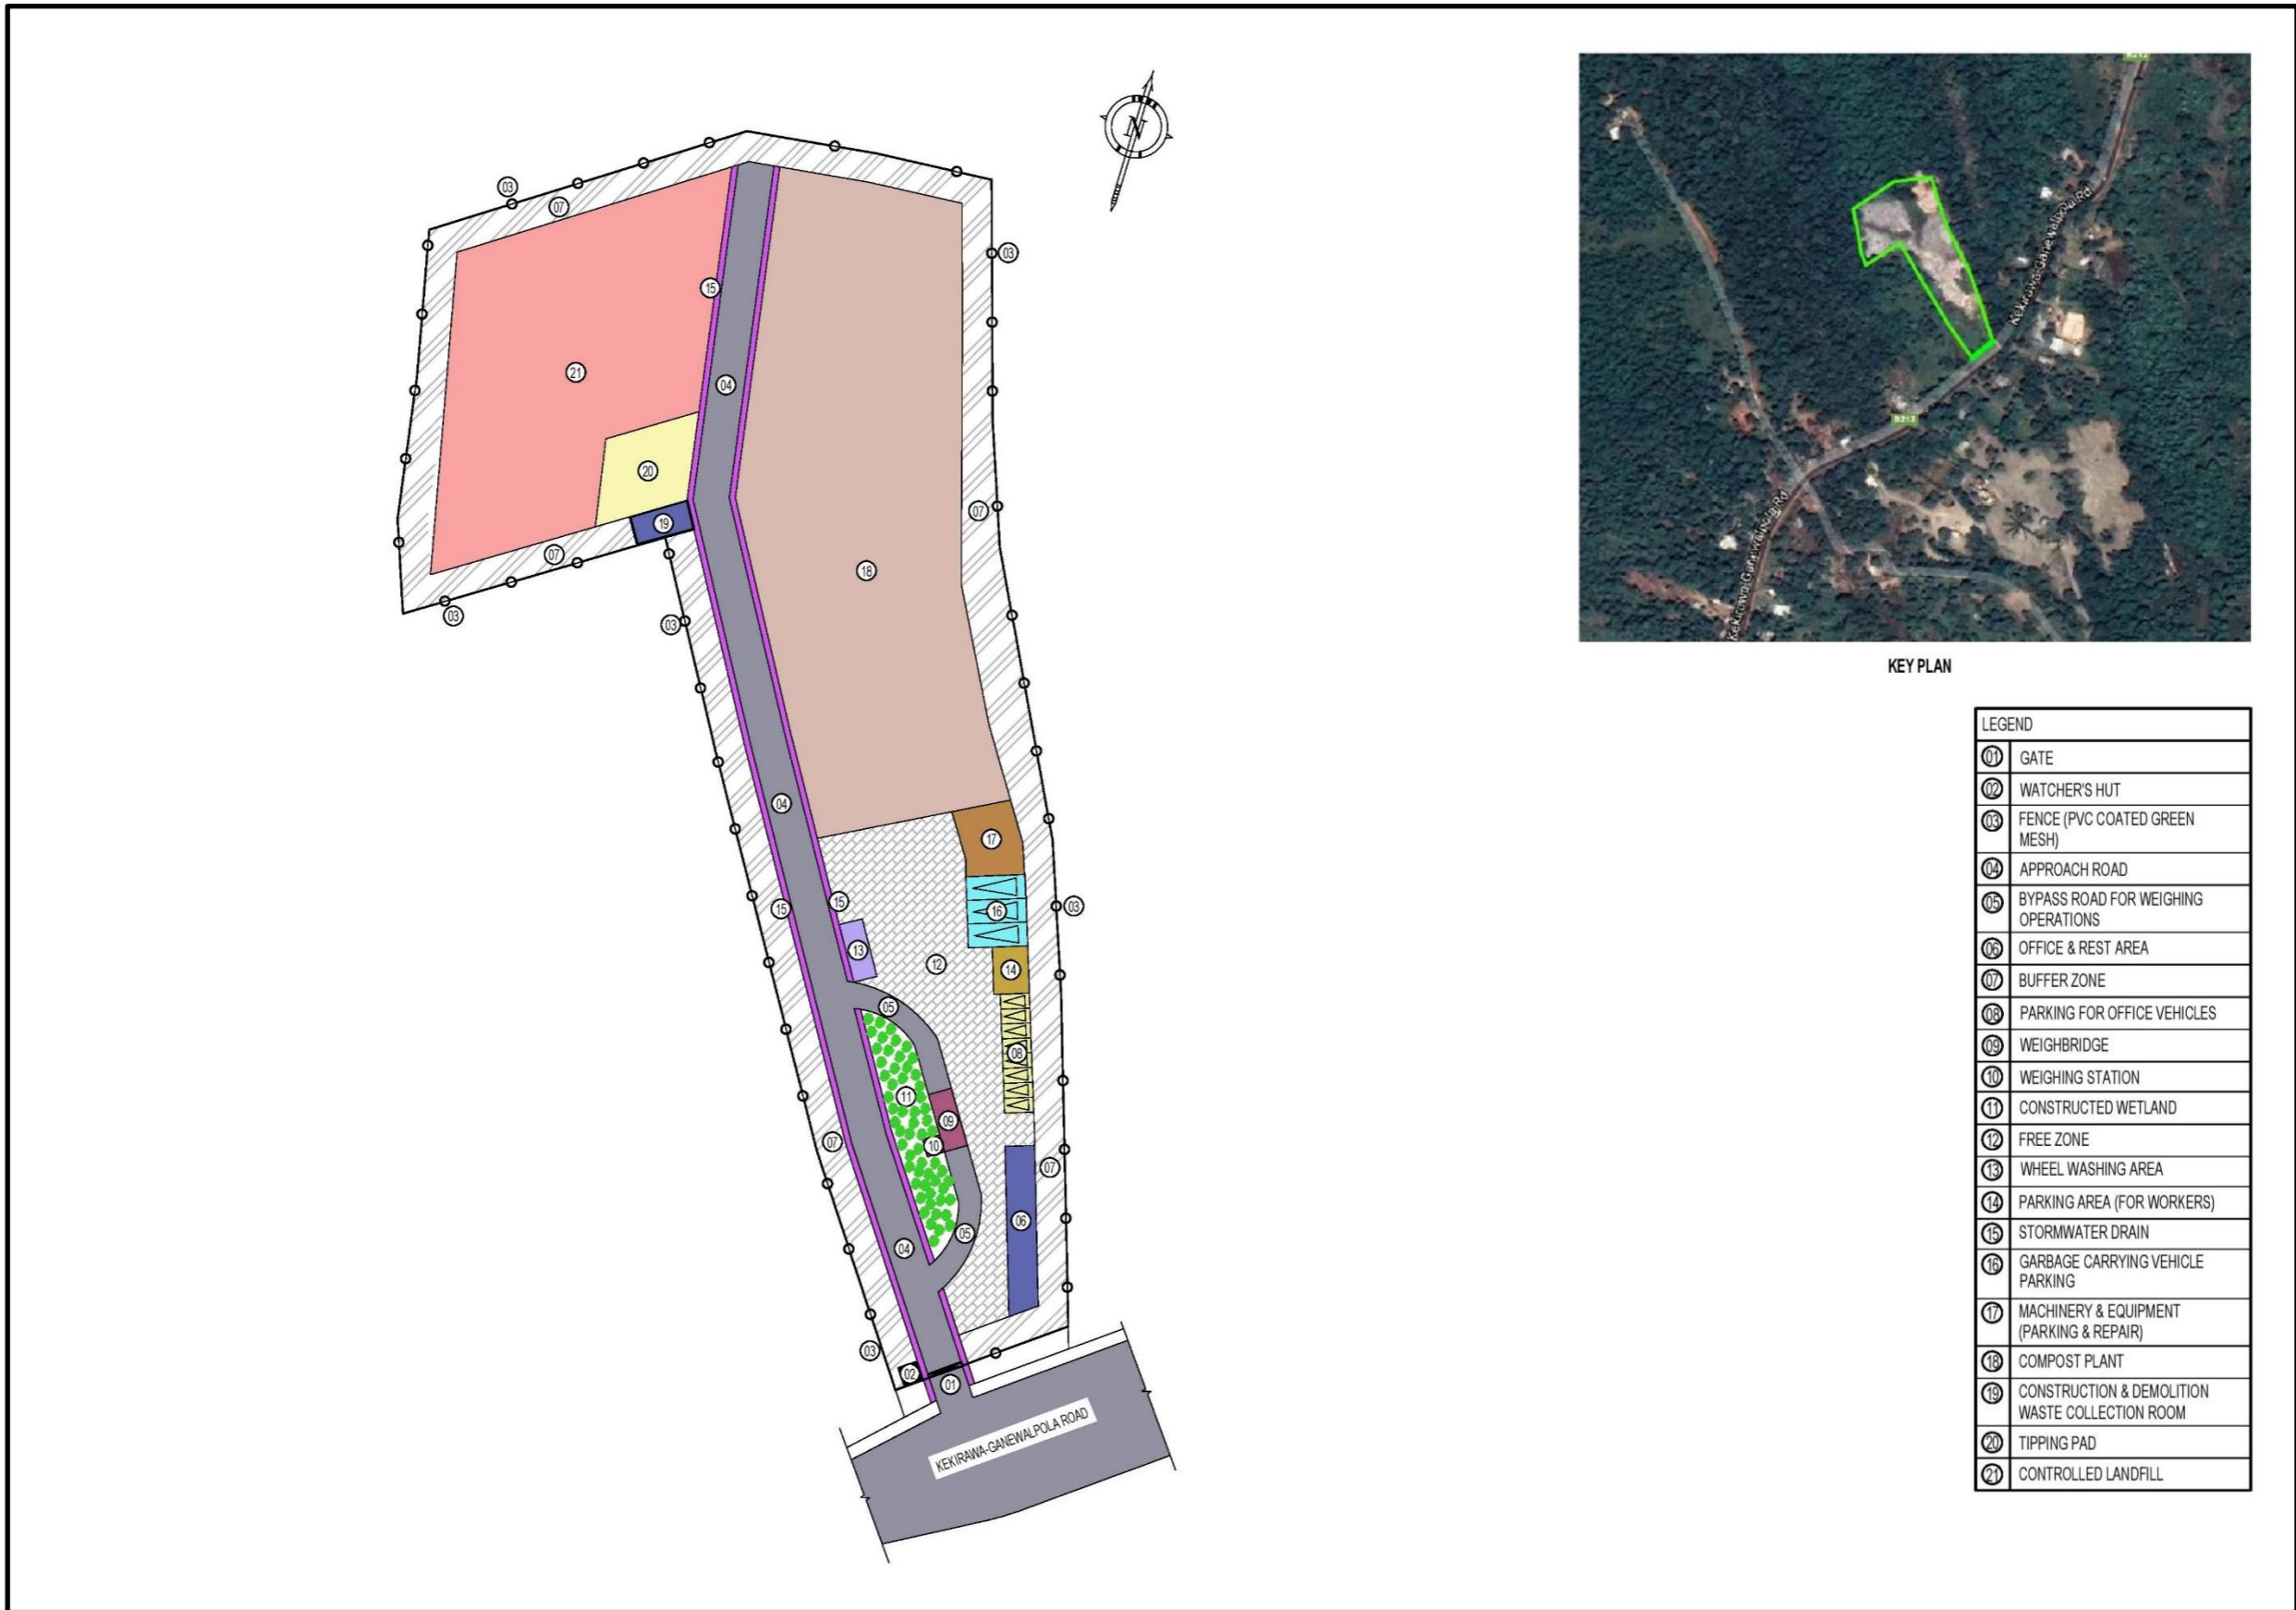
Proposed master plan of the ISWM facility of Kekirawa PS
